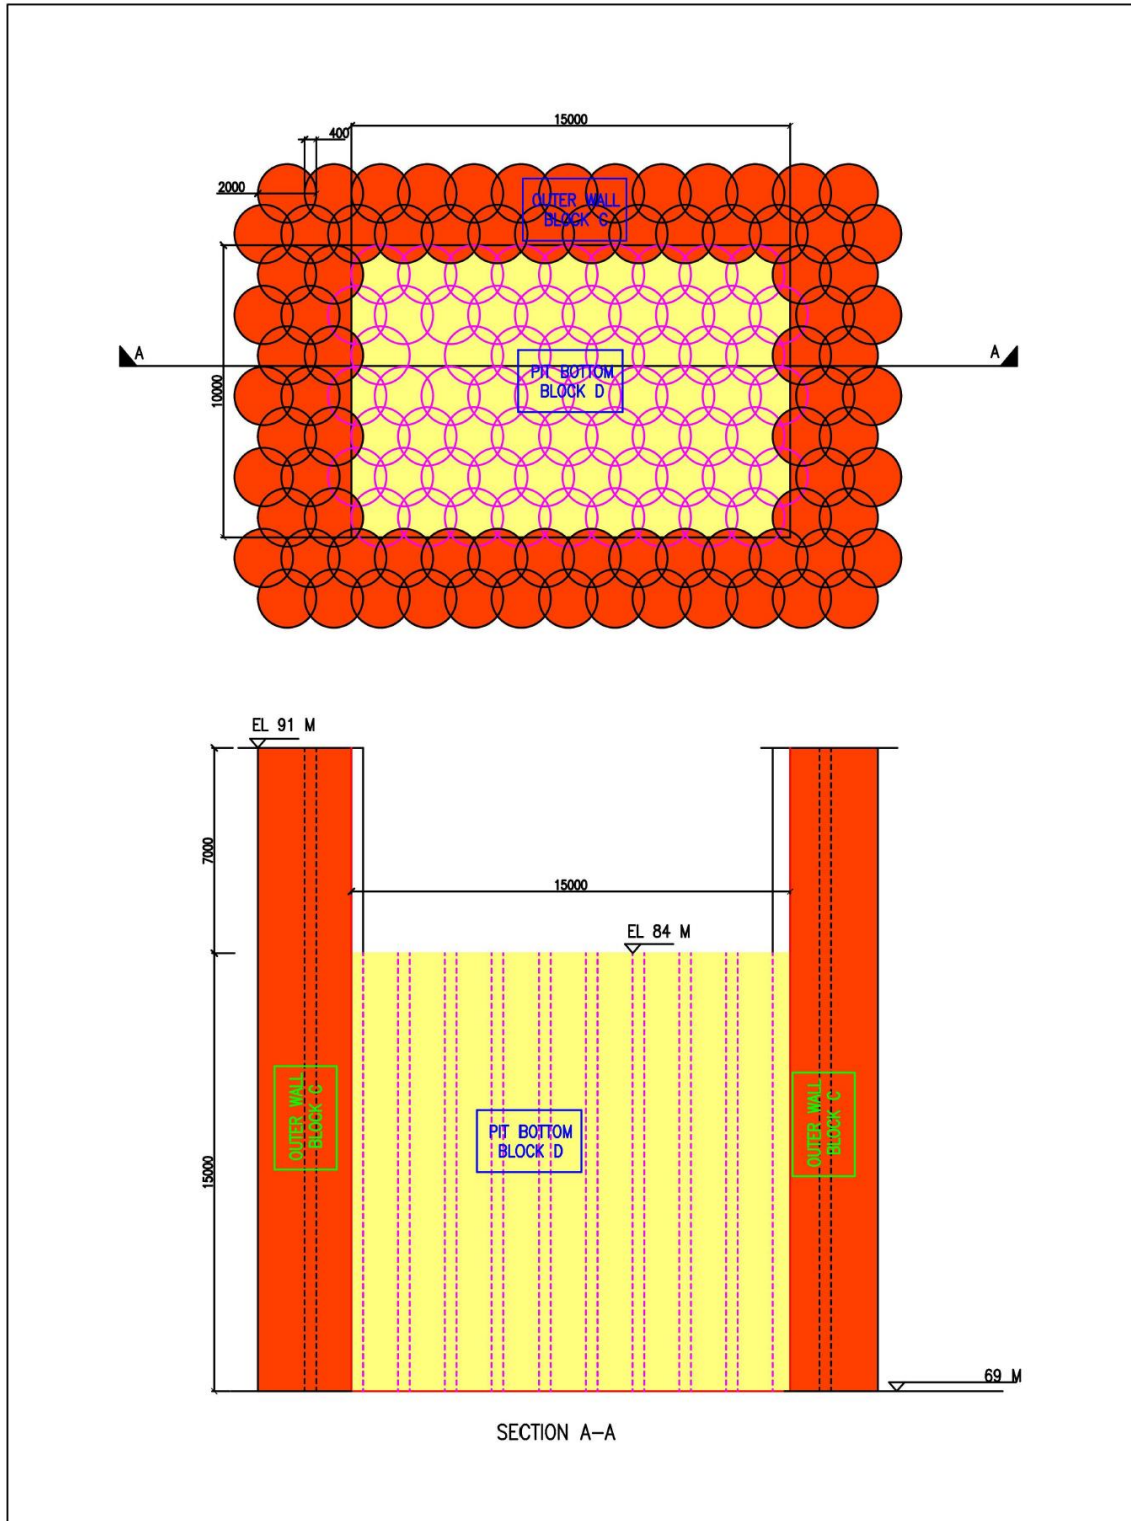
Tentative arrangement of block C (outer wall) and D (bottom pit) DSM trial (with 2.0 diameter columns) with an assumed overlap of 400 mm
